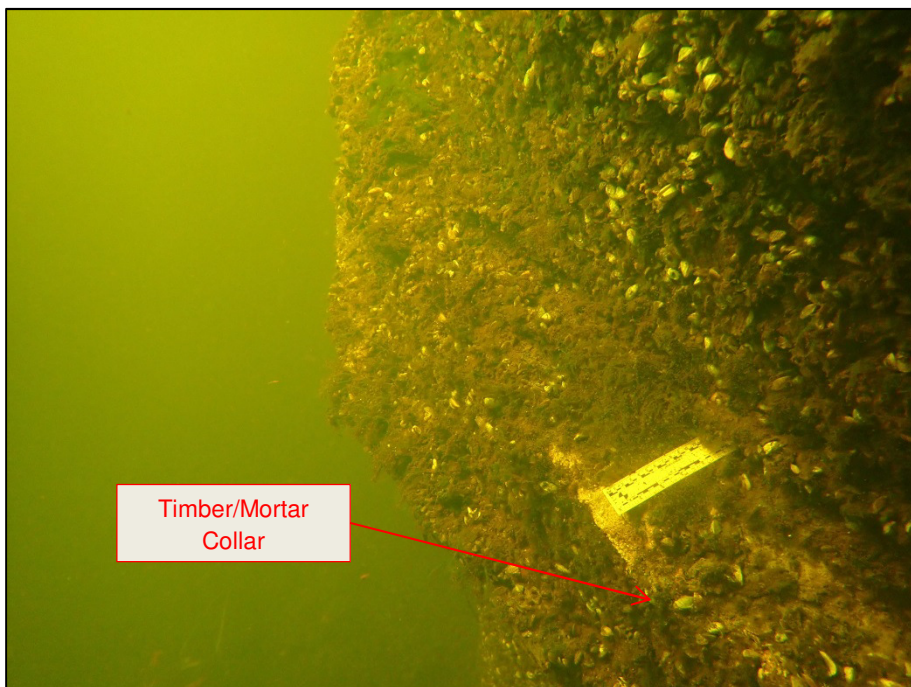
West-facing view of pier façade on north side of archway, Pier Number 2.
